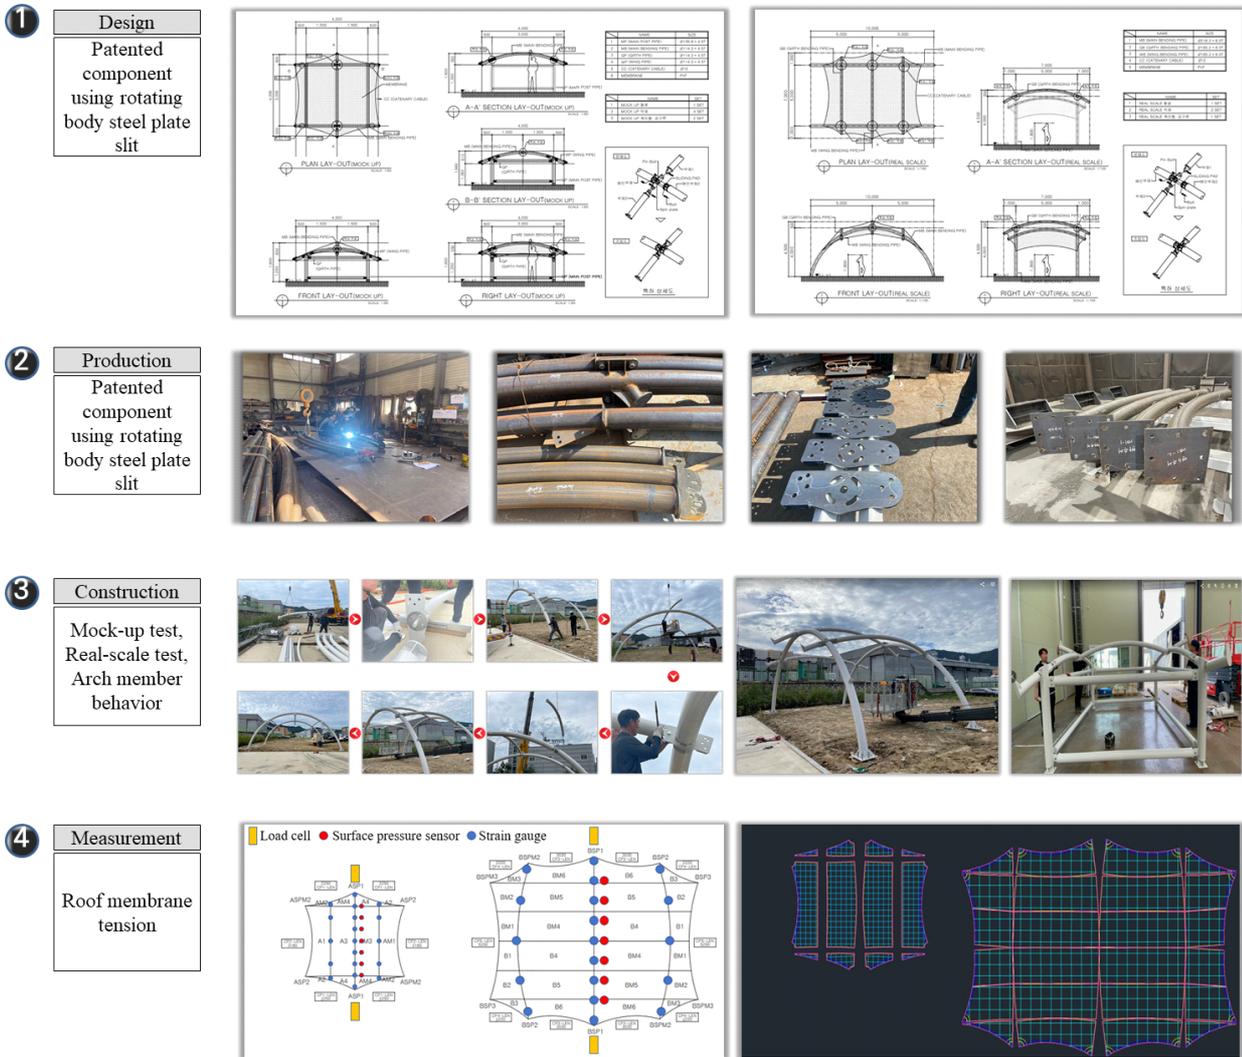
Verification of design, manufacturing, construction, and measurement techniques of new method using rotating body steel plate slit
